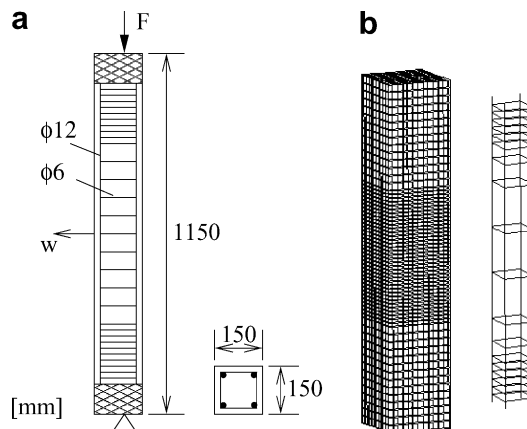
Geometry, loading setup and finite element mesh of the reinforced concrete columns subjected to eccentric compression.
